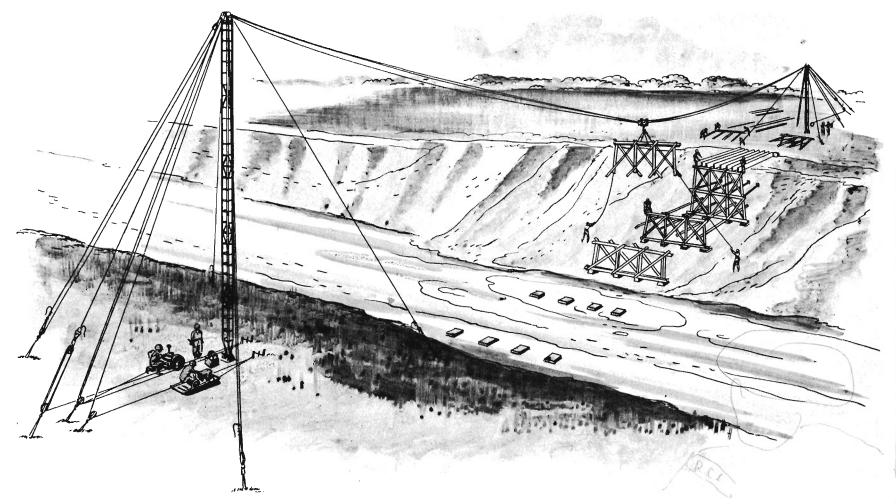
Medium cableway in position over bridge center line for erection of bridge.
